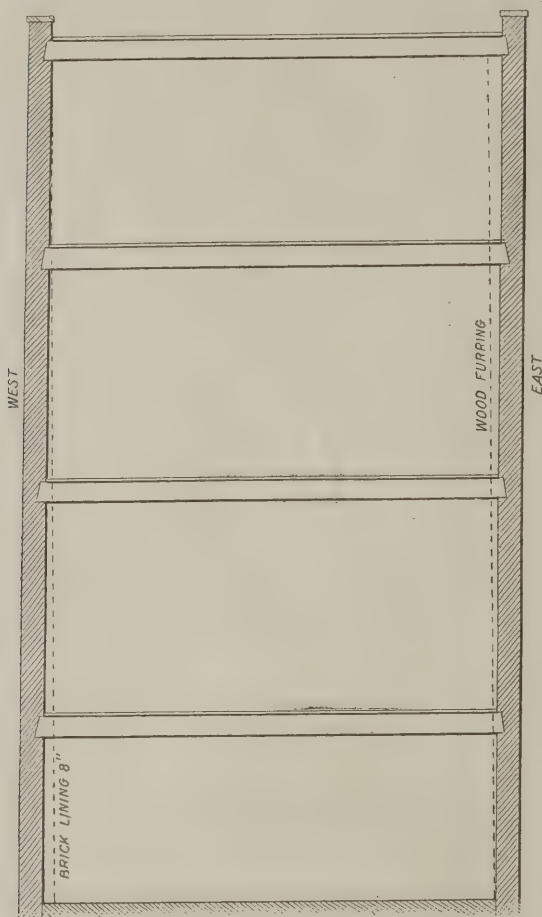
Showing How the Perpendicularity of the Interior Walls of a Building Out of Plumb Was Maintained.
